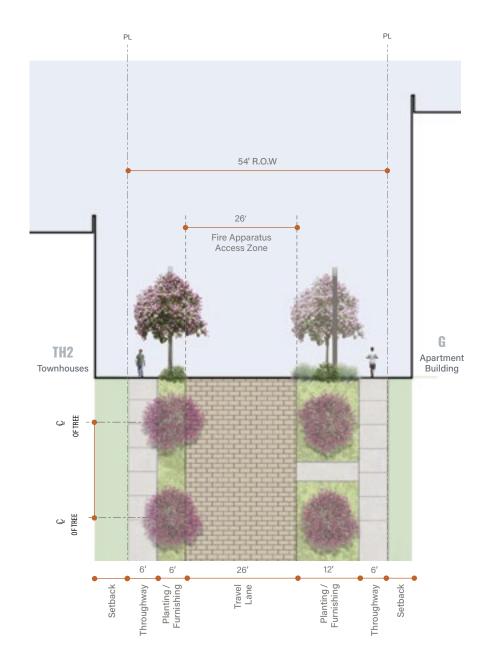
West Street North, Section 1 *see "Figure 5.15.2: West Street North, Plan Enlargement", Site Plan W.1
